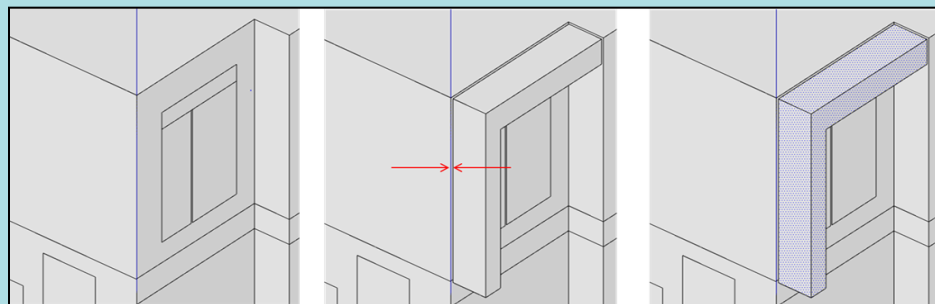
Shading elements on the building are modeled separately with a small space between the shading element and the building.
